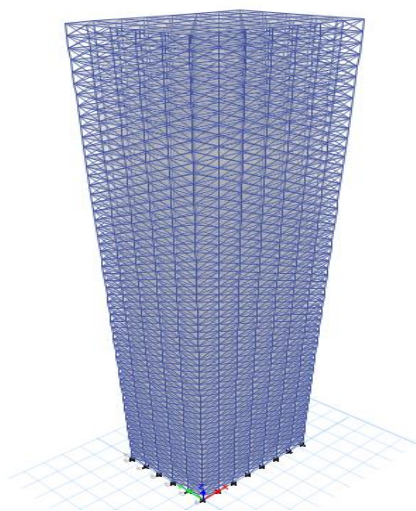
Elevational View of Rectangular Shaped X Bracing Building
